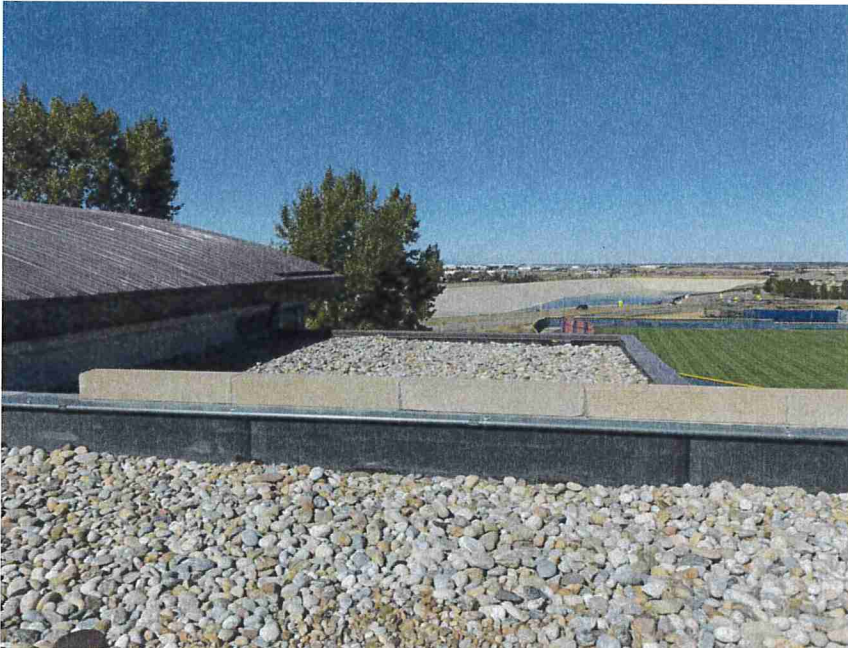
View of the northeast ballasted EPDM area adjacent to the standing seam metal roof located west of the ballasted EPDM.
